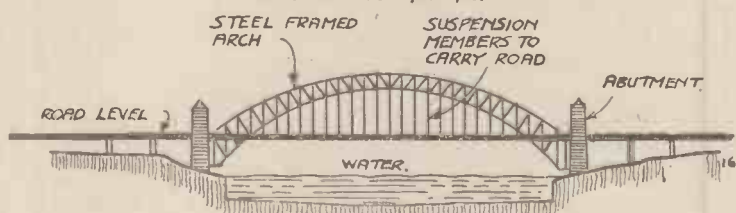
The steel-framed arch bridge used for very large spans. This illustration shows the outline of Sydney Harbour Bridge, Australia, with a span of 1,650 feet; the largest arched bridge in the world designed and constructed by British engineers.
